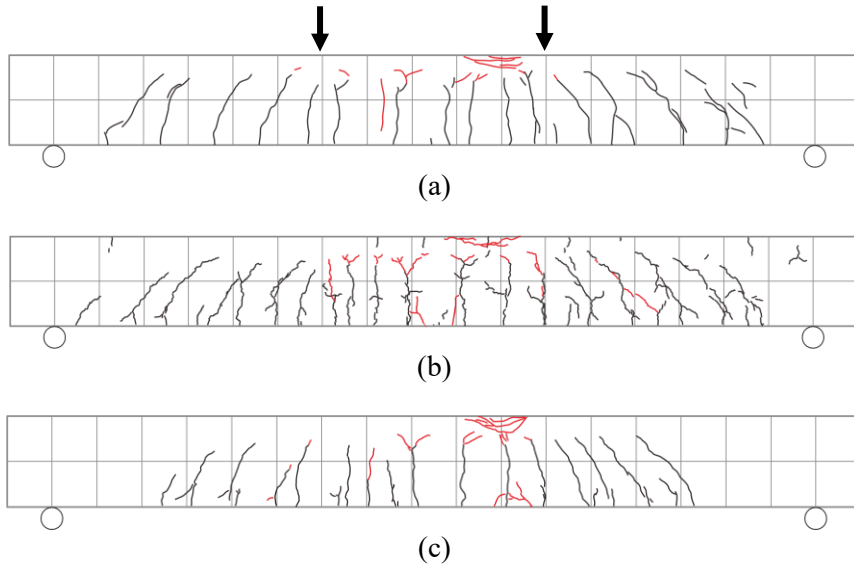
Failure of 30 MPa concrete RC beams: (a) SRTA30; (b) ScTA30; (c) ScTS30
